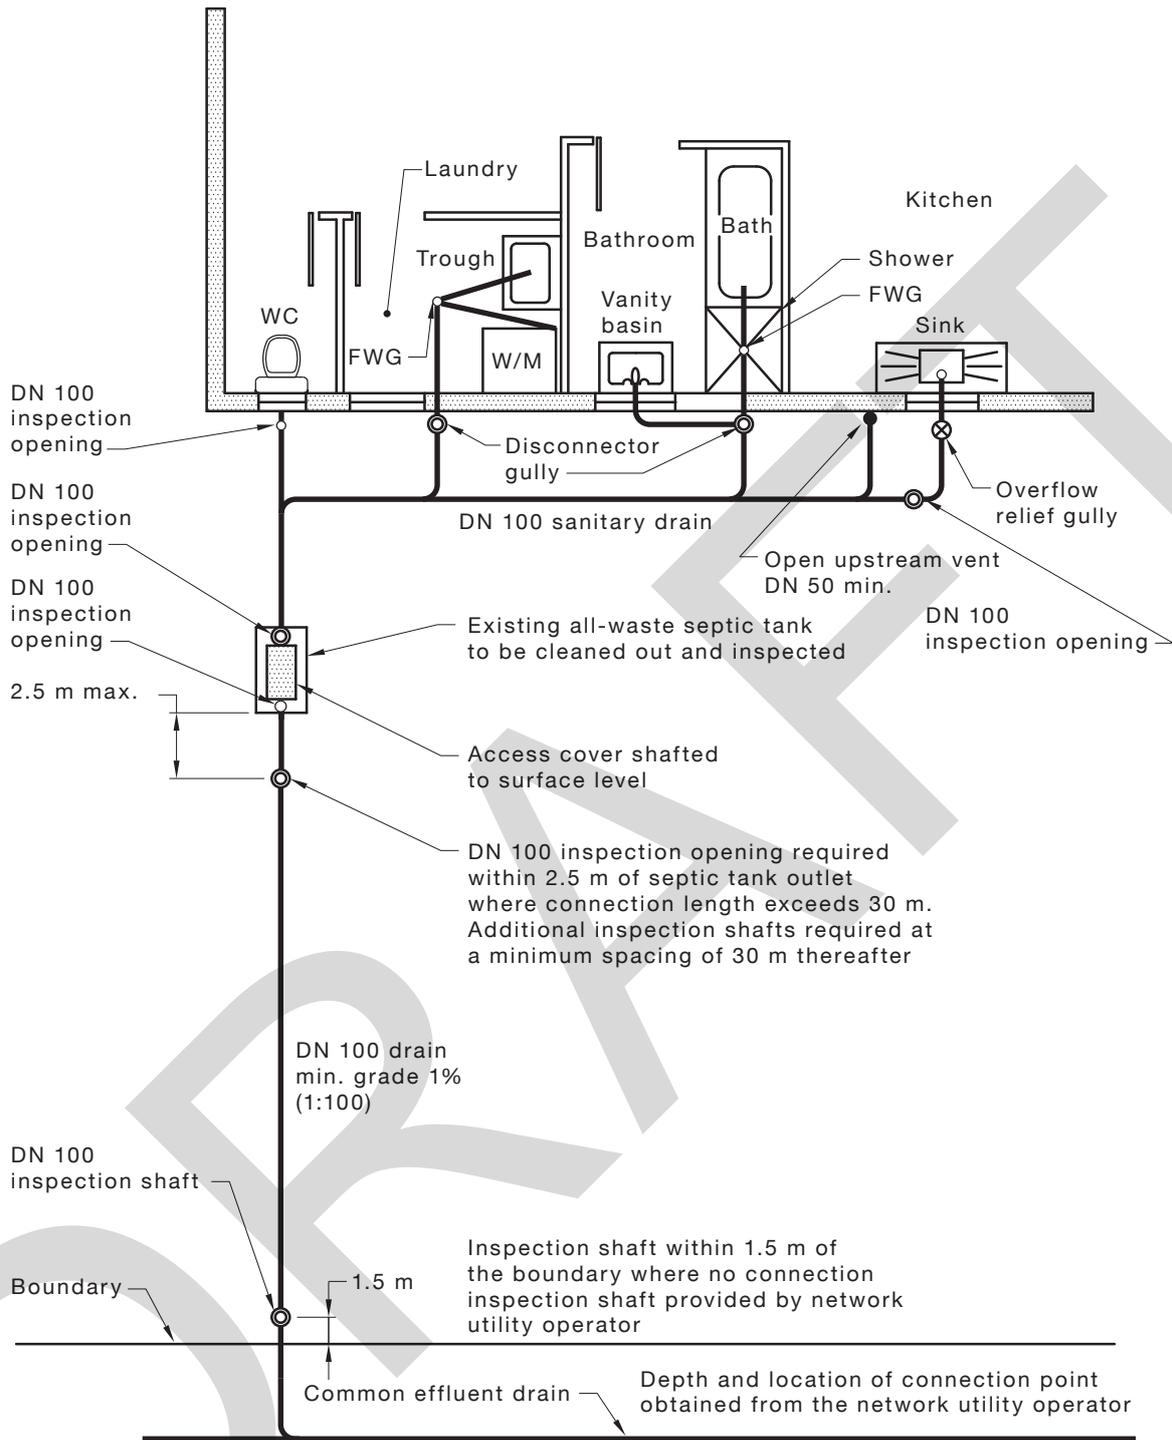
(C) TYPICAL CONNECTION DETAILS FOR AN ALL-WASTE SEPTIC TANK SYSTEM
